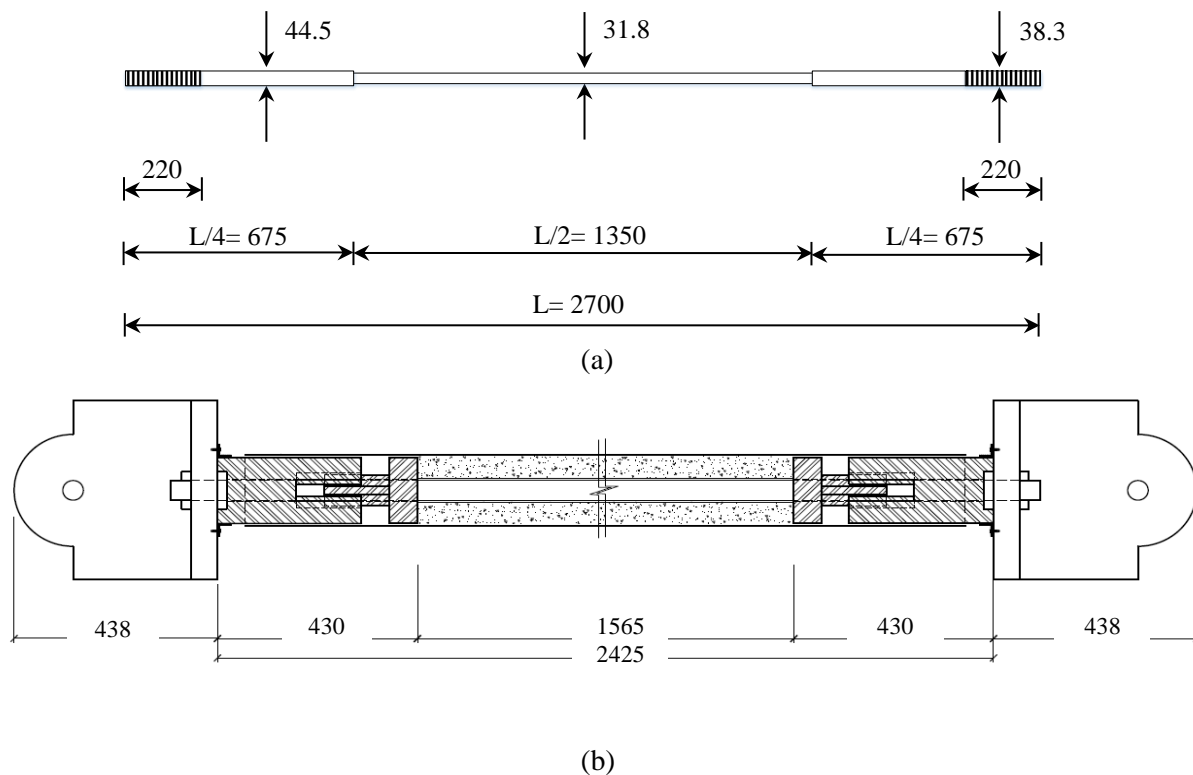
Side elevation of the BRB: a) steel core bar; and b) BRB components (All dimensions in mm)
